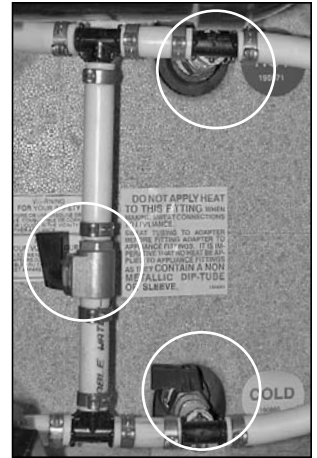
Selector valve position for supply from the exterior fresh water tank.
